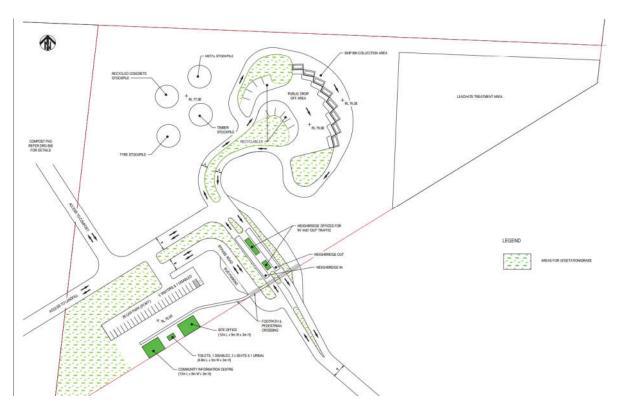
Site entrance, transfer station and resource recovery area plan
